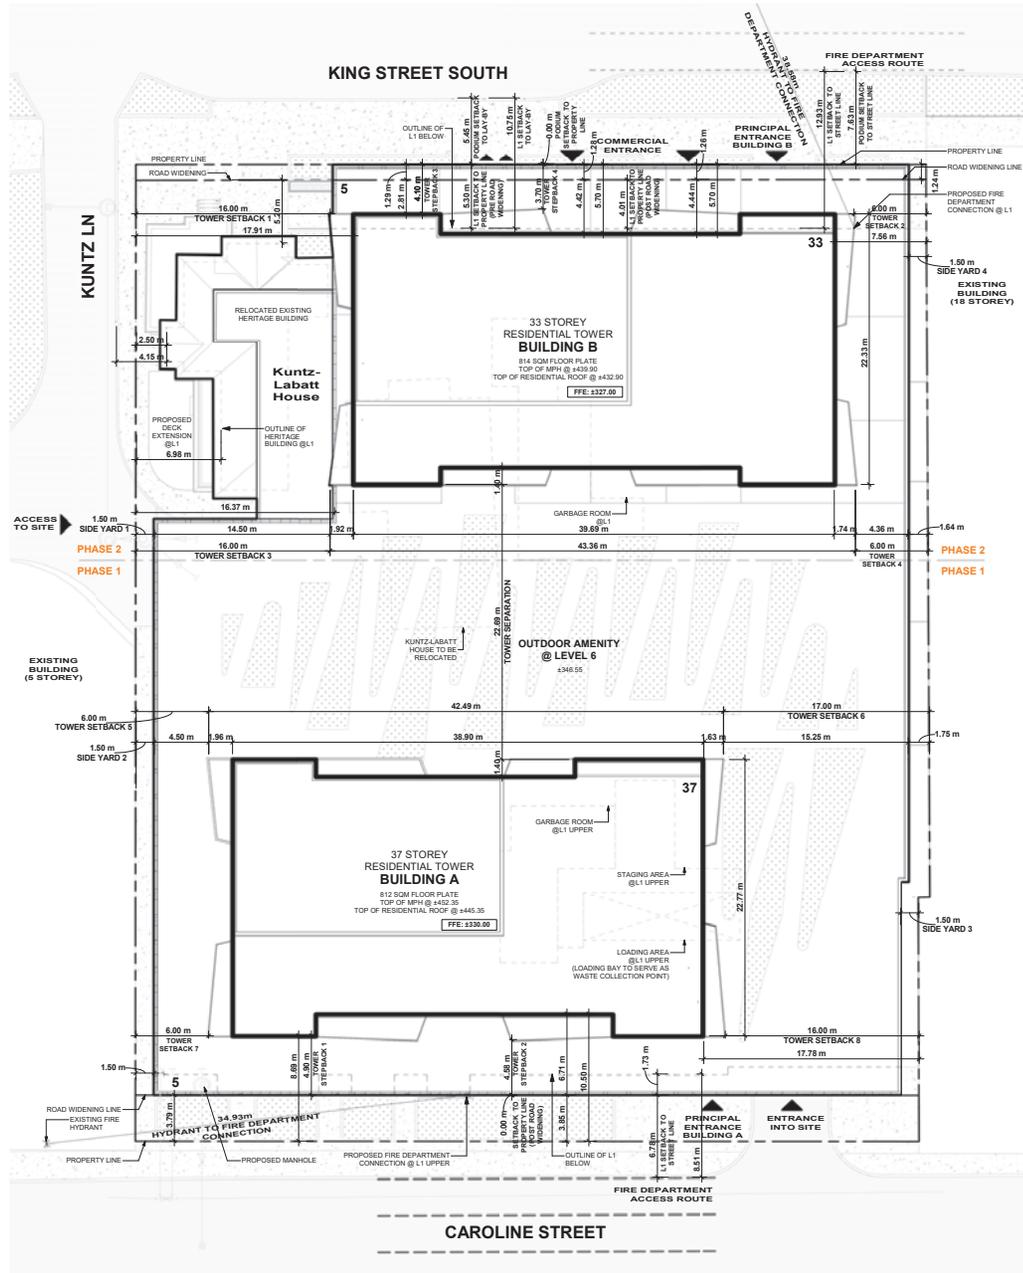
Proposed Site Plan (Kirkor Architects and Planners, July 2025)
